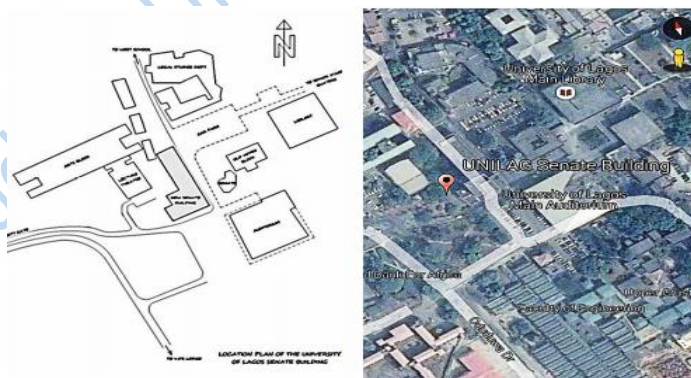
Location plan of Unilag Senate House (Source – Author’s field work)
